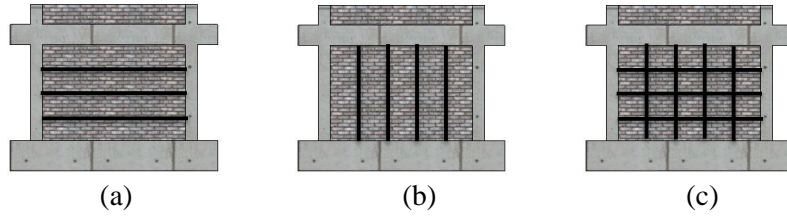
Retrofitting strategies for one bay frame: (a) retrofitted specimen with horizontal bars; (b) retrofitted specimen with vertical bars, (c) retrofitted specimen with horizontal and vertical bars
